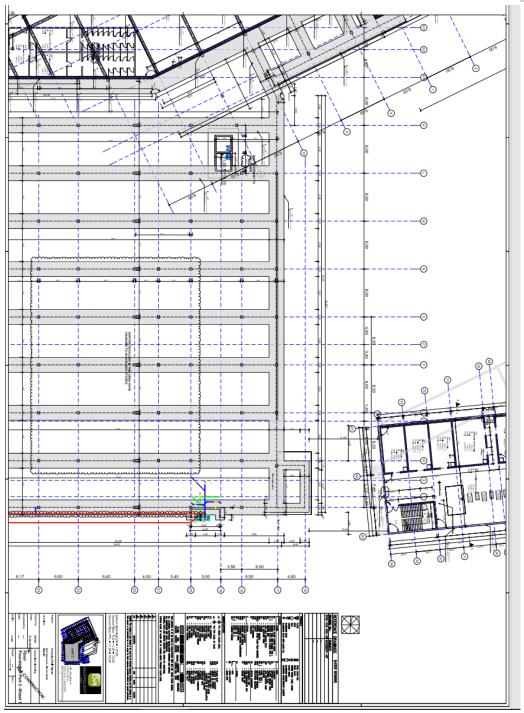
AIP Foundation (Part 2 Sheet 2)
